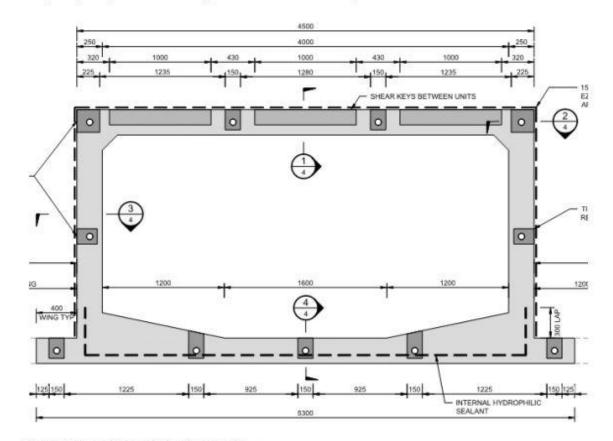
Typical Section through box-section culvert: Beca/Opus (2016)
